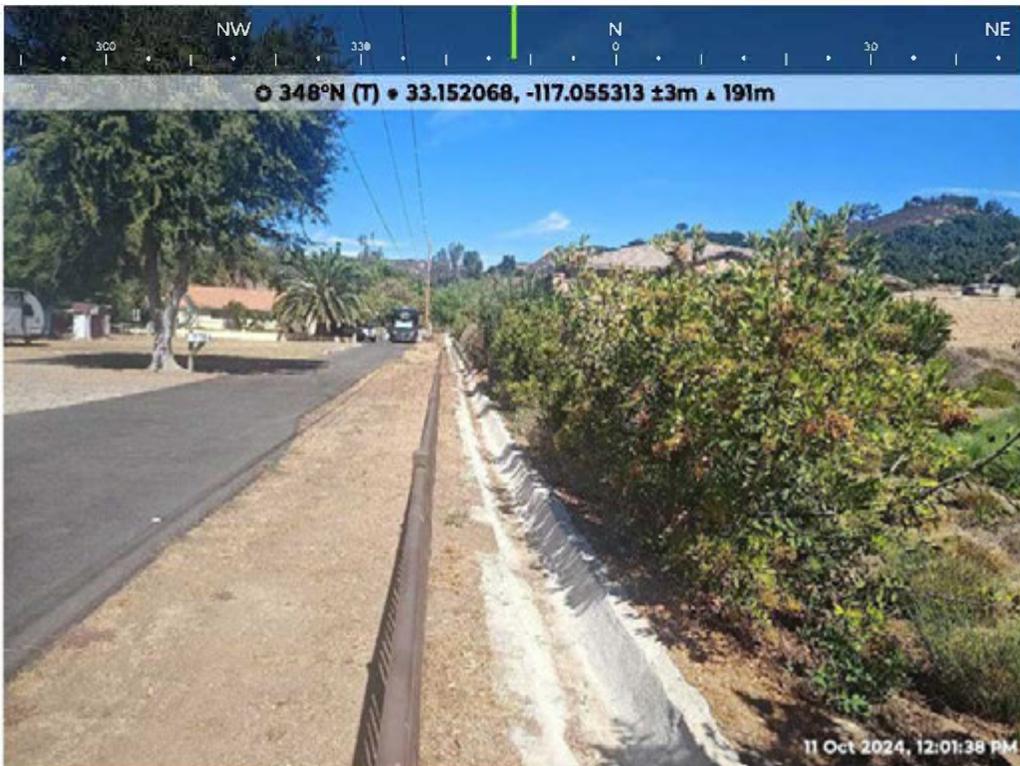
View facing north of concrete-lined brow ditch west of the large detention basin/bioswale.
